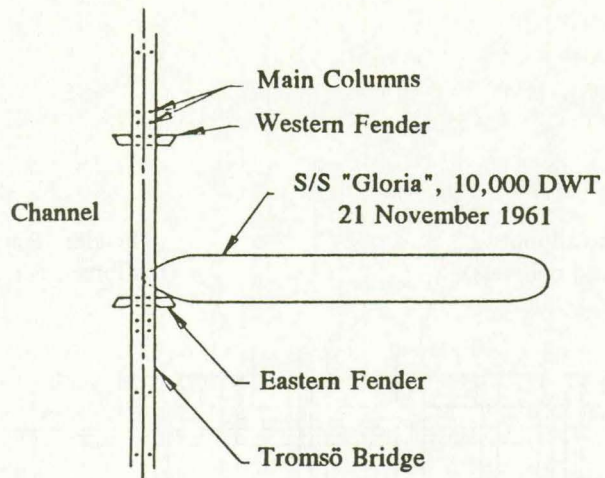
Plan of 1961 Ship Collision with the Tromso Bridge, Norway [11].
